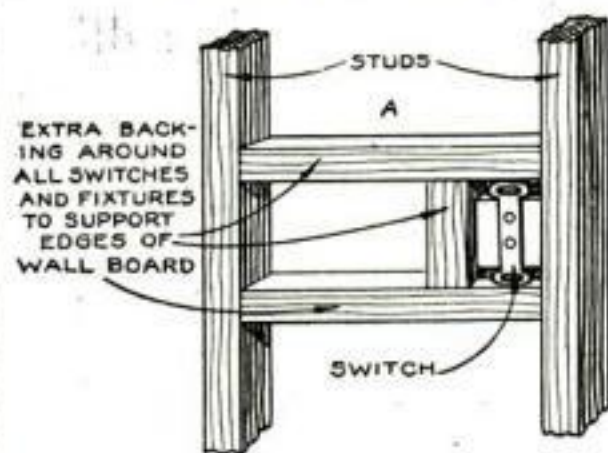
Backing for the wall board must be placed around all switches and fixtures.
